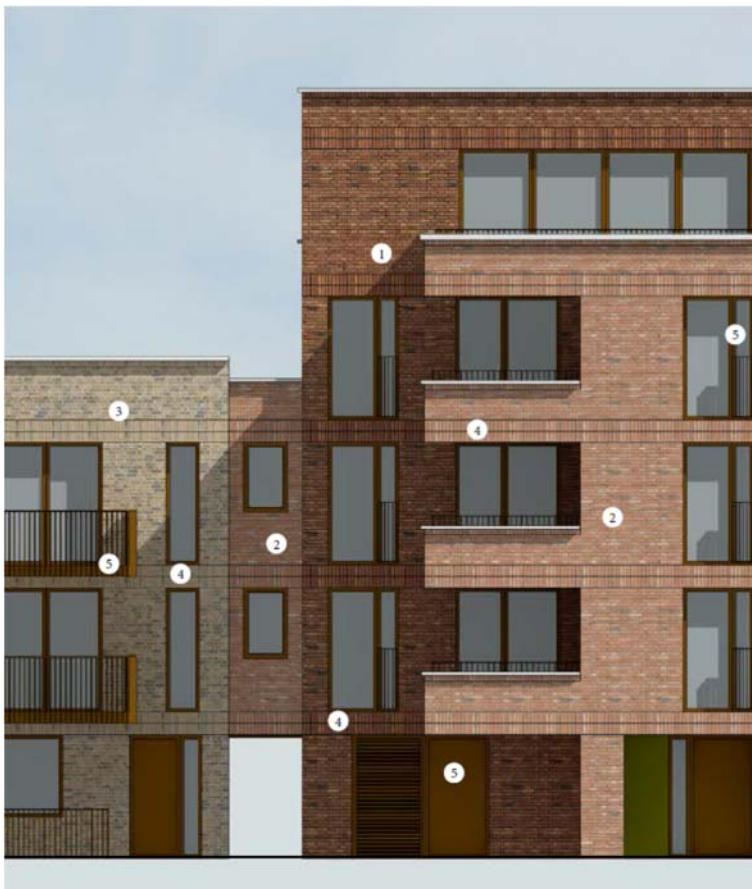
Front elevation with suggested materials for Site A. Please note this is a working draft
